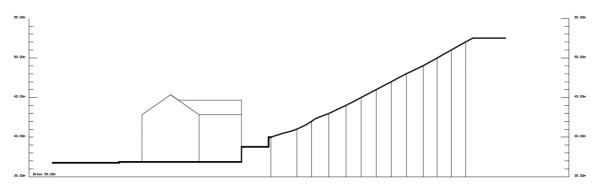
Cross section through site showing the neighbouring site rising to >7metres above the ridge of the Northumberland Arms
